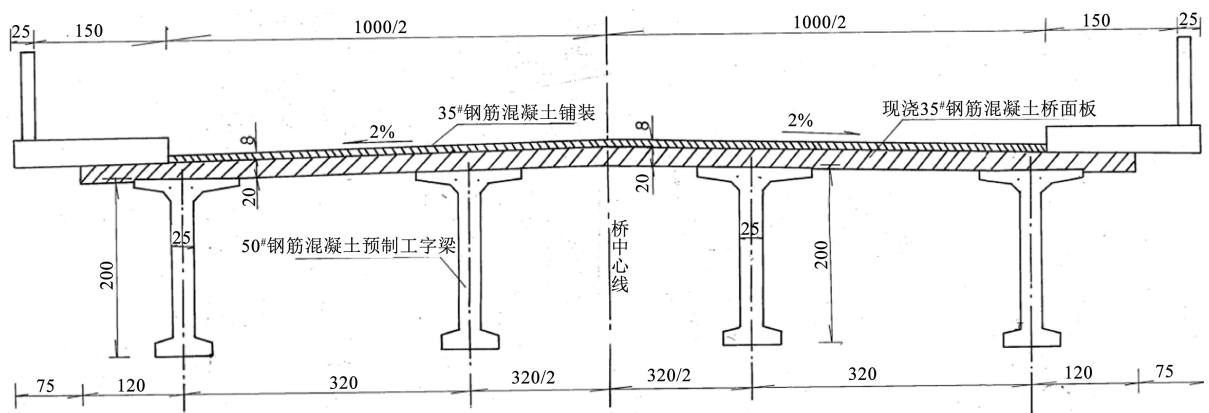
Cross-sectional layout of longitudinal beams in cable-stayed frame of Nange bridge
